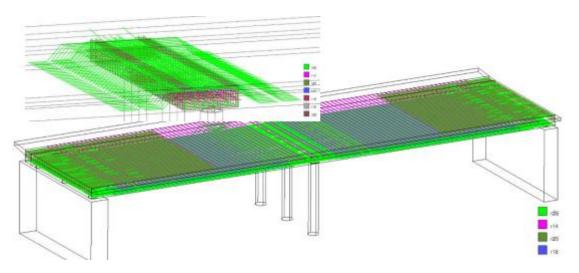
Overview on the reinforcement in the concrete slab showing the detail of the reinforcement arrangement above the middle piers (Cervenka et al., 2020(a)).
